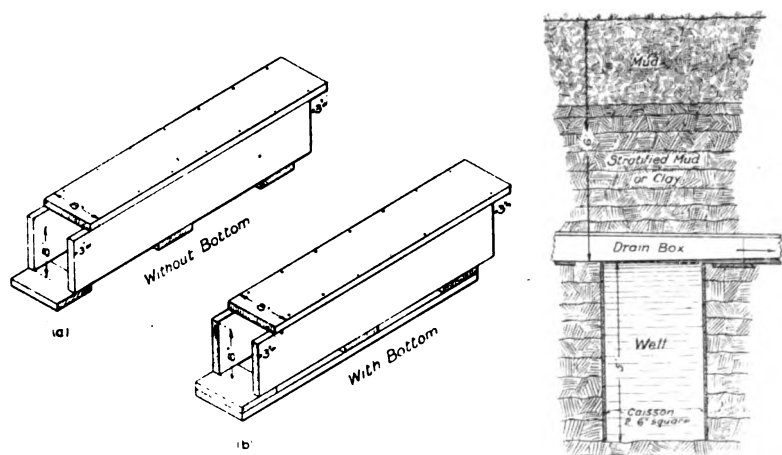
(a) and (b) Drain Boxes Used on Geary Farm.
